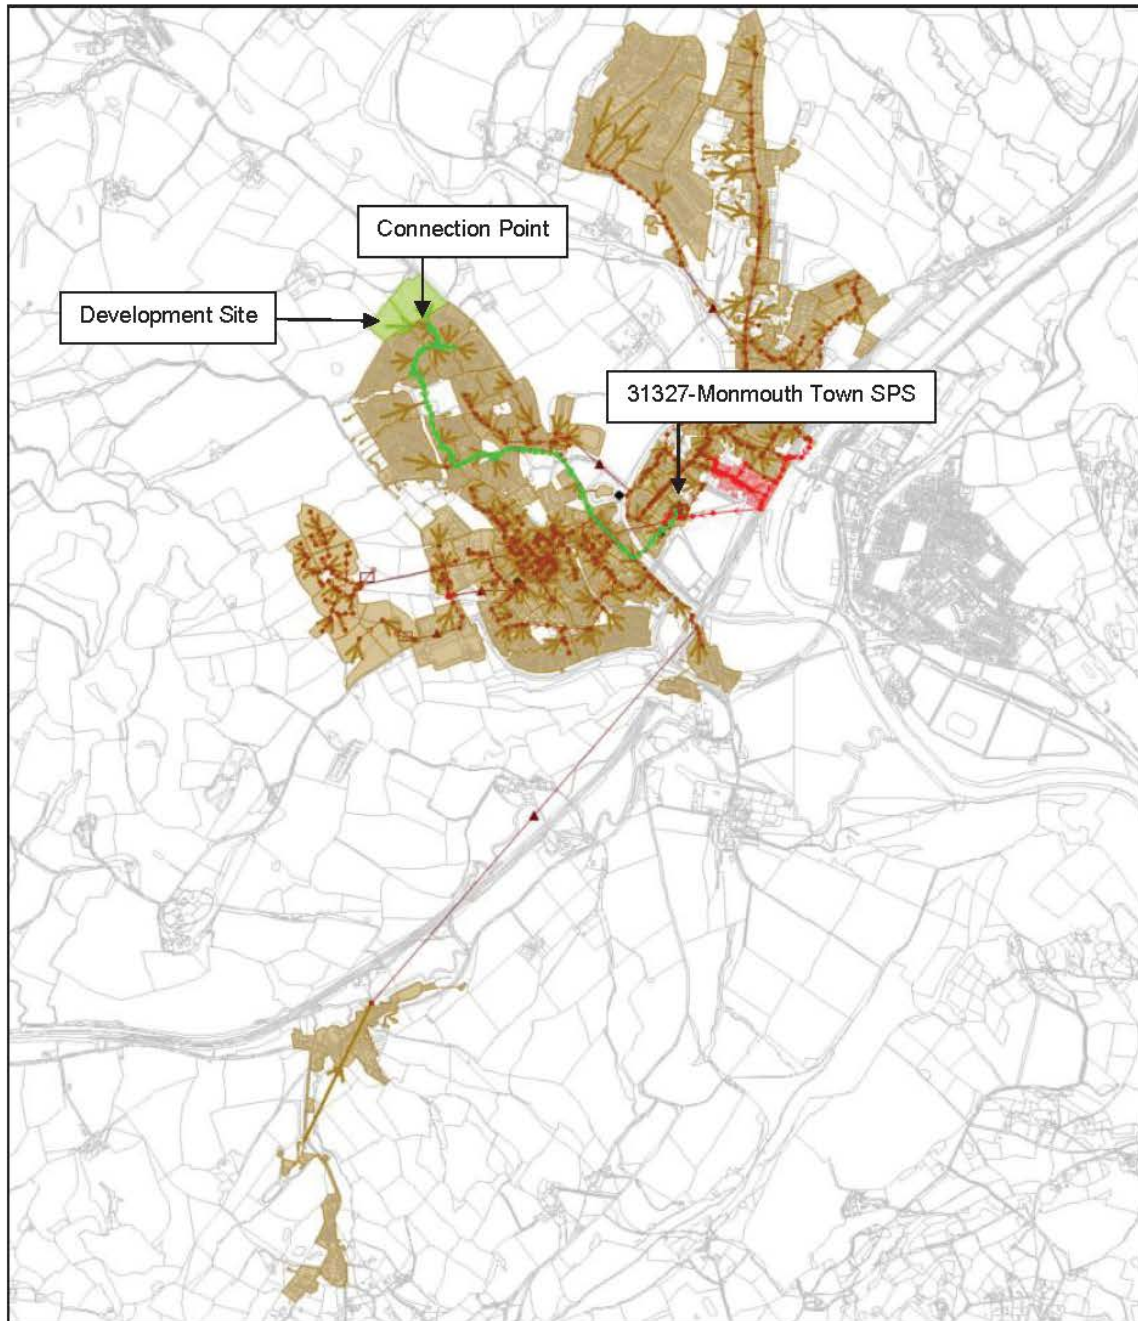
Catchment overview plan – including development site and proposed connection point.
